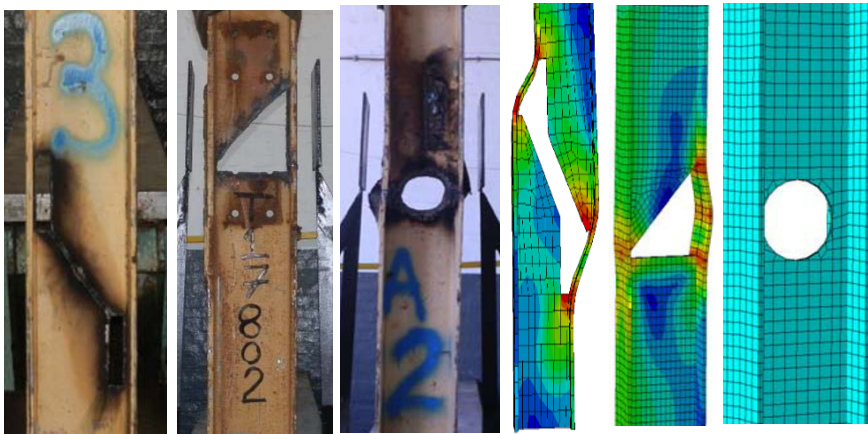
Selected techniques for weakening columns: (a) double window cut used with explosives; (b) triangular window cut used to cause a hinge; and (c) circular window cut used for general weakening of structures, from van Jaarsveldt & Walls (2016).
